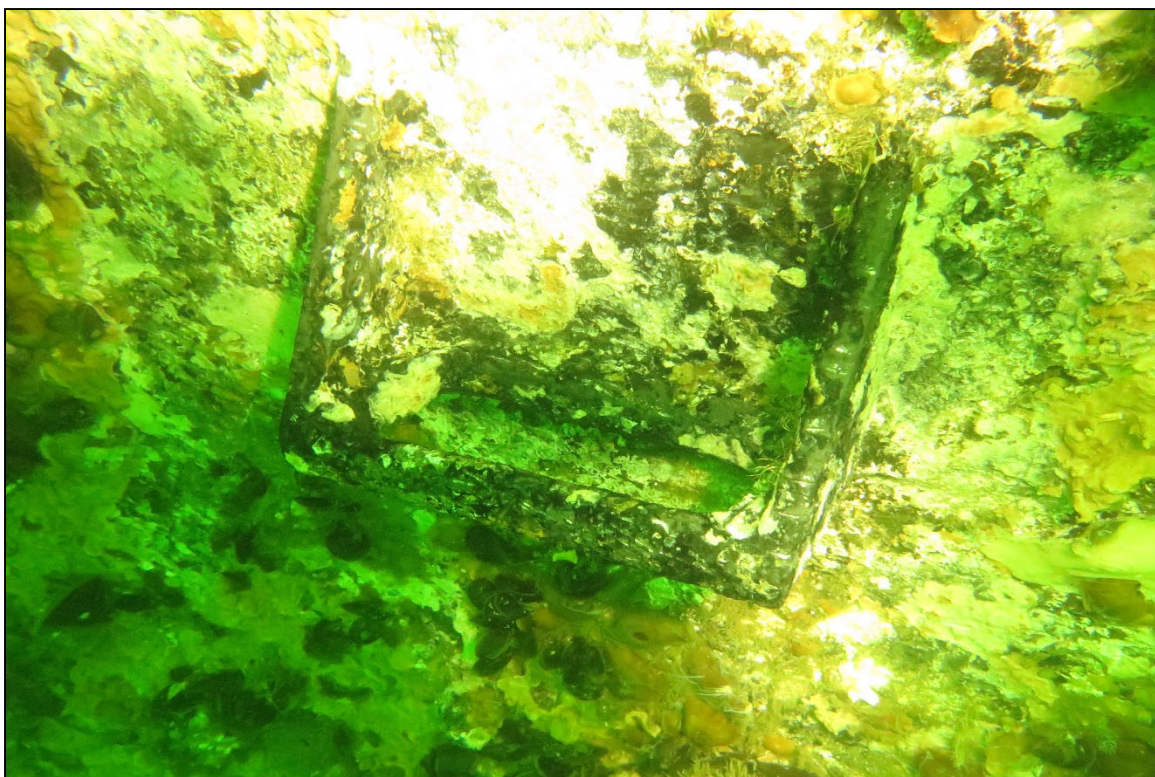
View from Above of Cleanout Structure Bracket W5 at Chamber Base with Slotted Opening for Anchor Bolt.
